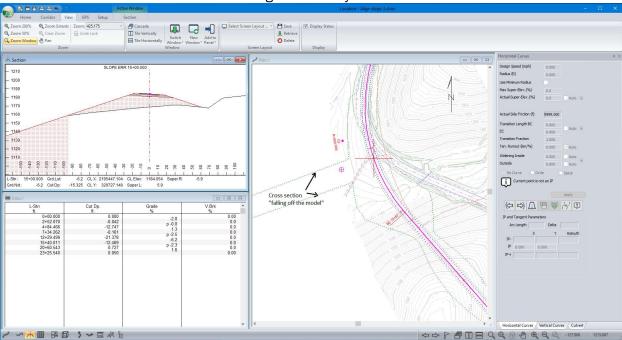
Plan* and Section Windows Depicting What Occurs When The Road Section Extends Beyond the Original Ground Surface Model
